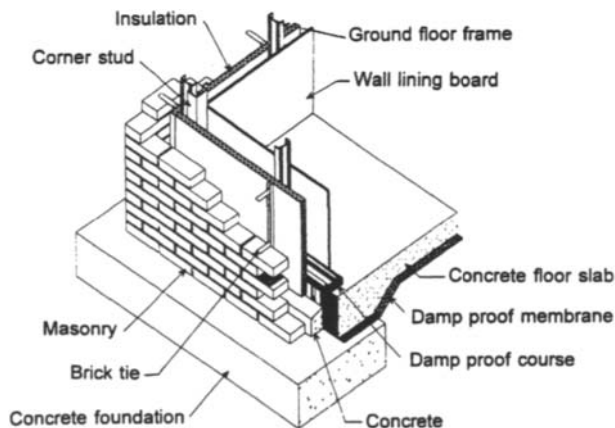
Typical wall construction for domestic buildings, Grubb and Lawson (1997)
